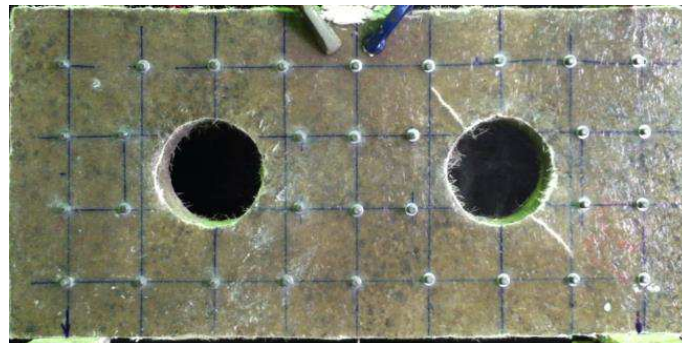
Failure mode of Beam specimen - Control LS-C16
